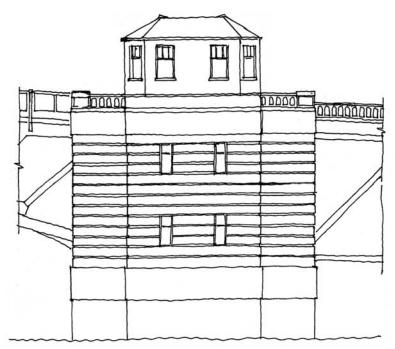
Existing Operator's House Profile (as shown on the 1929 bridge drawings)
